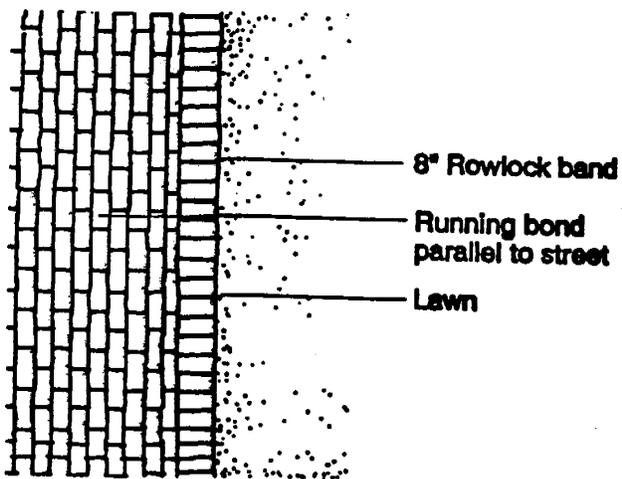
Holland Precinct Standard Sidewalk Paving
